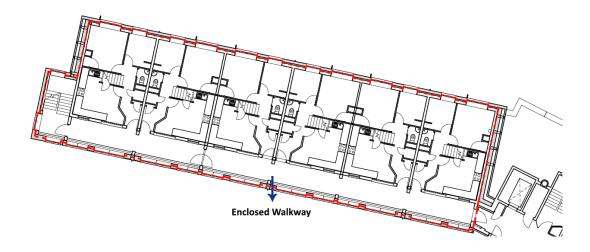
Airtight layer in a typical walkway level (ECD Architects, 2013).
